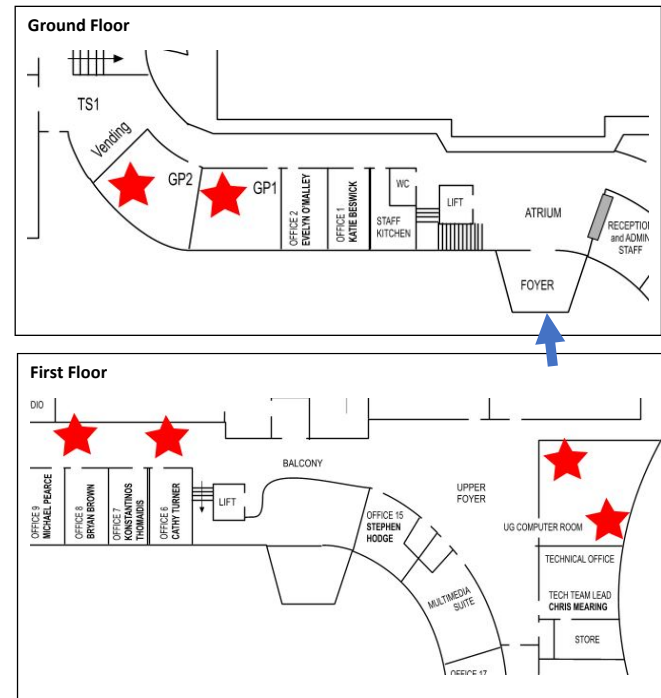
prOphecy sun and Reese Muntean, Carrying Others, 2019. White House Gallery and Alexander Building floor plan.
